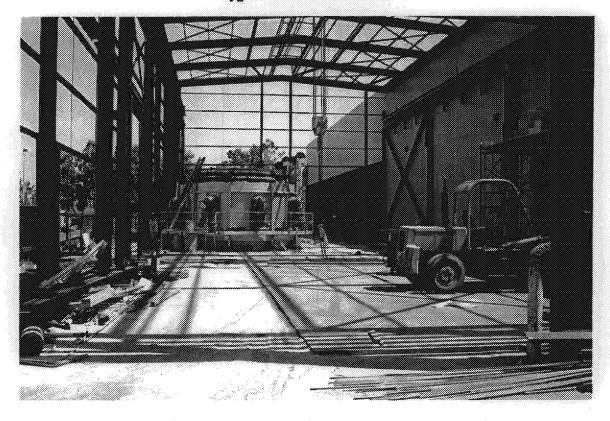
New Furnace for 35,000-ton Press at 5321 Firestone Blvd.
